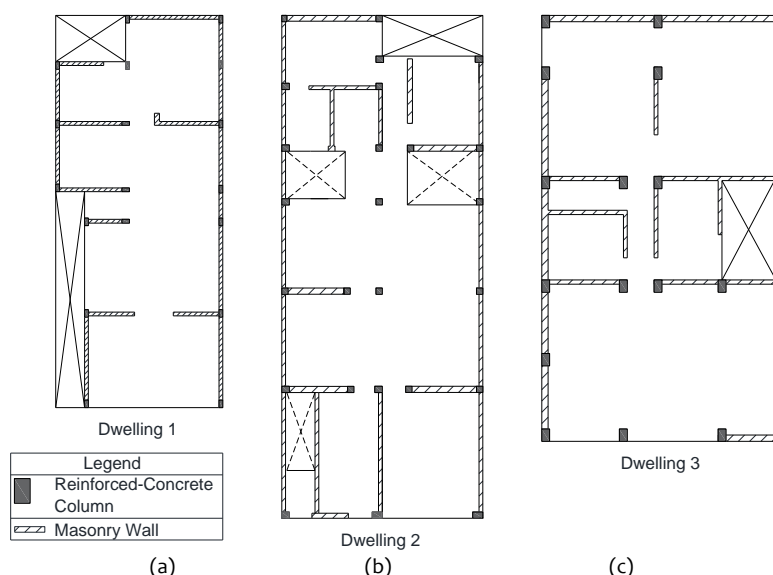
Typical floor plans of the confined masonry dwelling typologies analyzed. (a) Dwelling 1. (b) Dwelling 2. (c) Dwelling 3.
